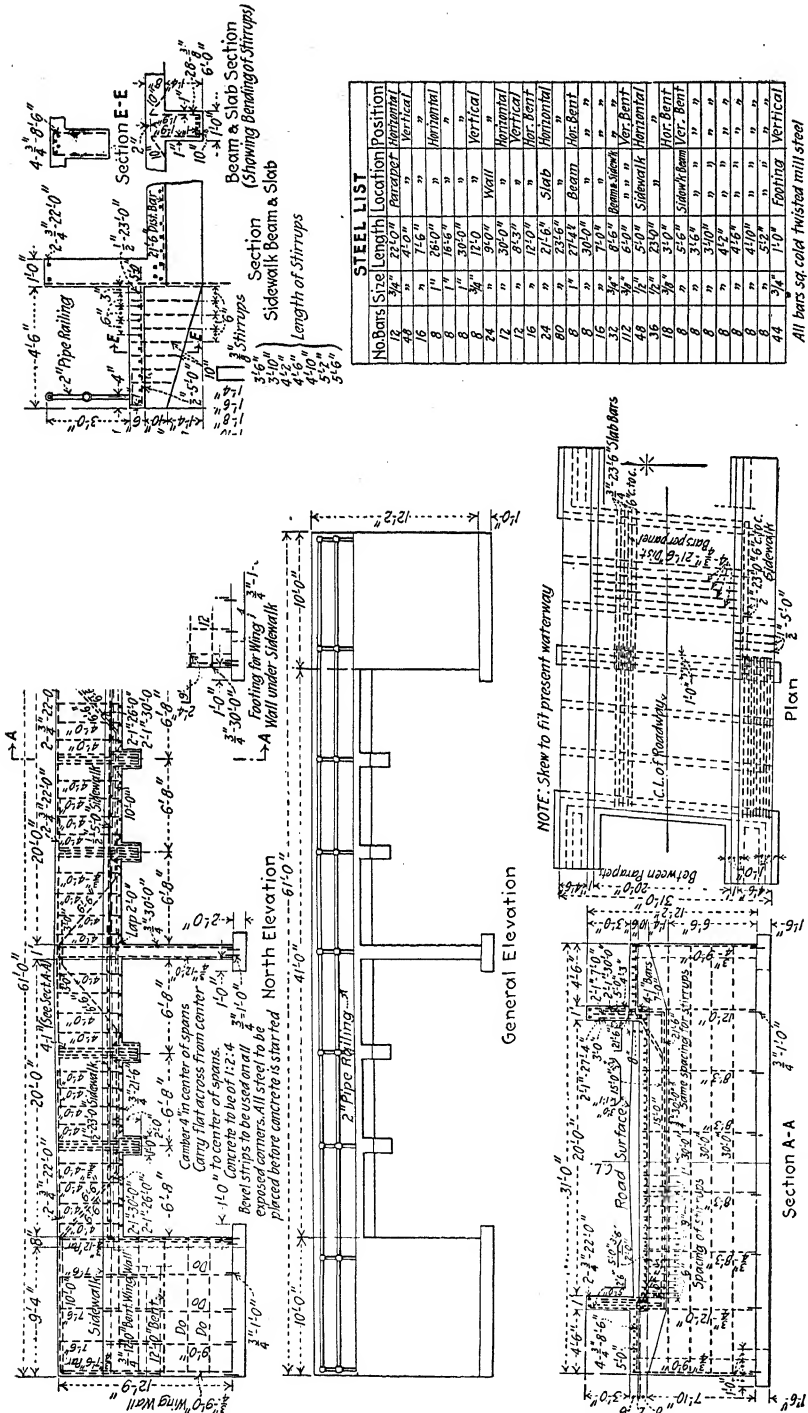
A.—Typical reinforced concrete parapet girder bridge on firm soil foundation.
